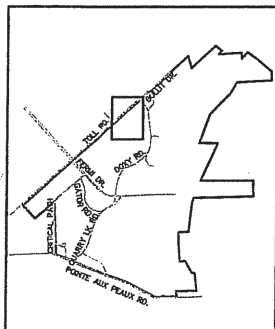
A NEW OPERATIONS ACCESS ROAD PLAN VIEW A
